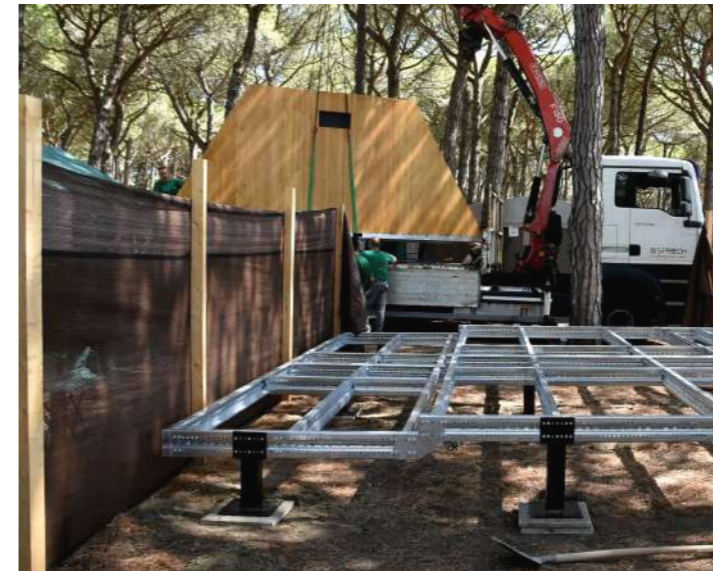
Images of the installation of the prefabricated bathroom and dressing room module
